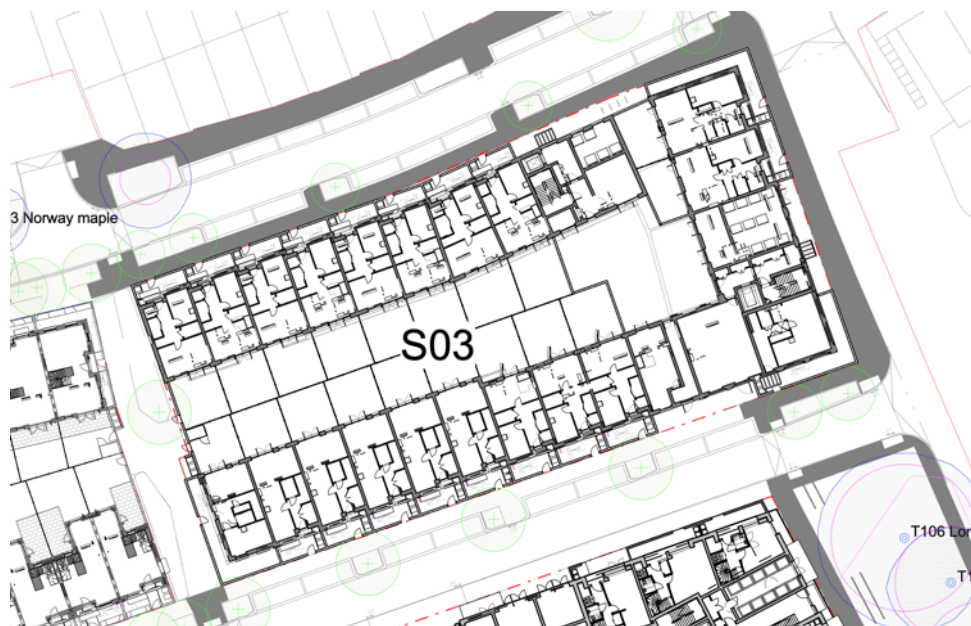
Extract from the Site Plan showing the ground floor of subplot 3
